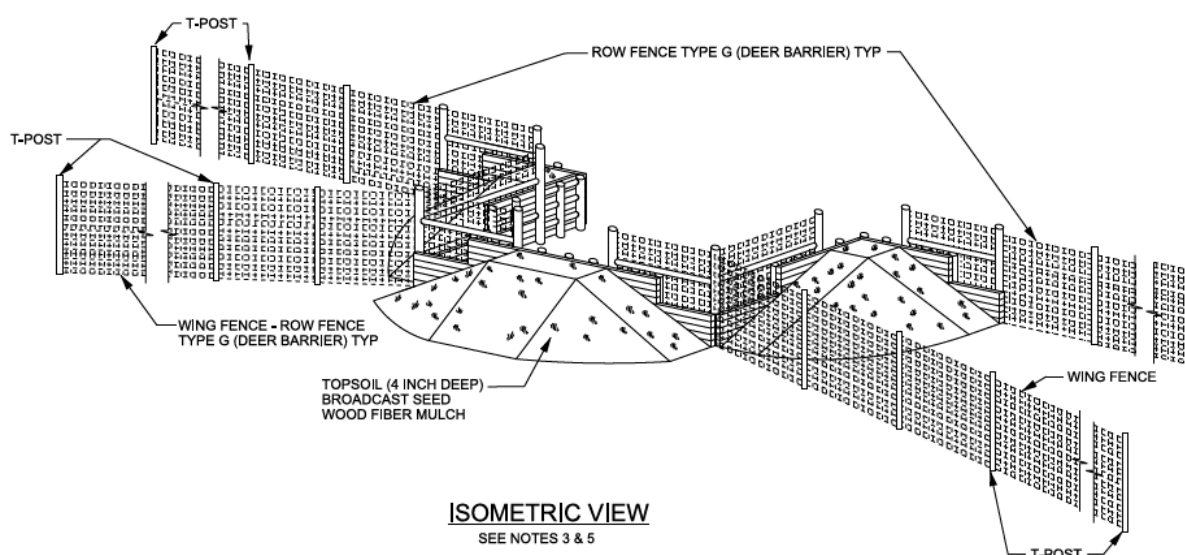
Multiple escape ramps used to allow a fencing funnel to the ramps (UDOT, 2014).
